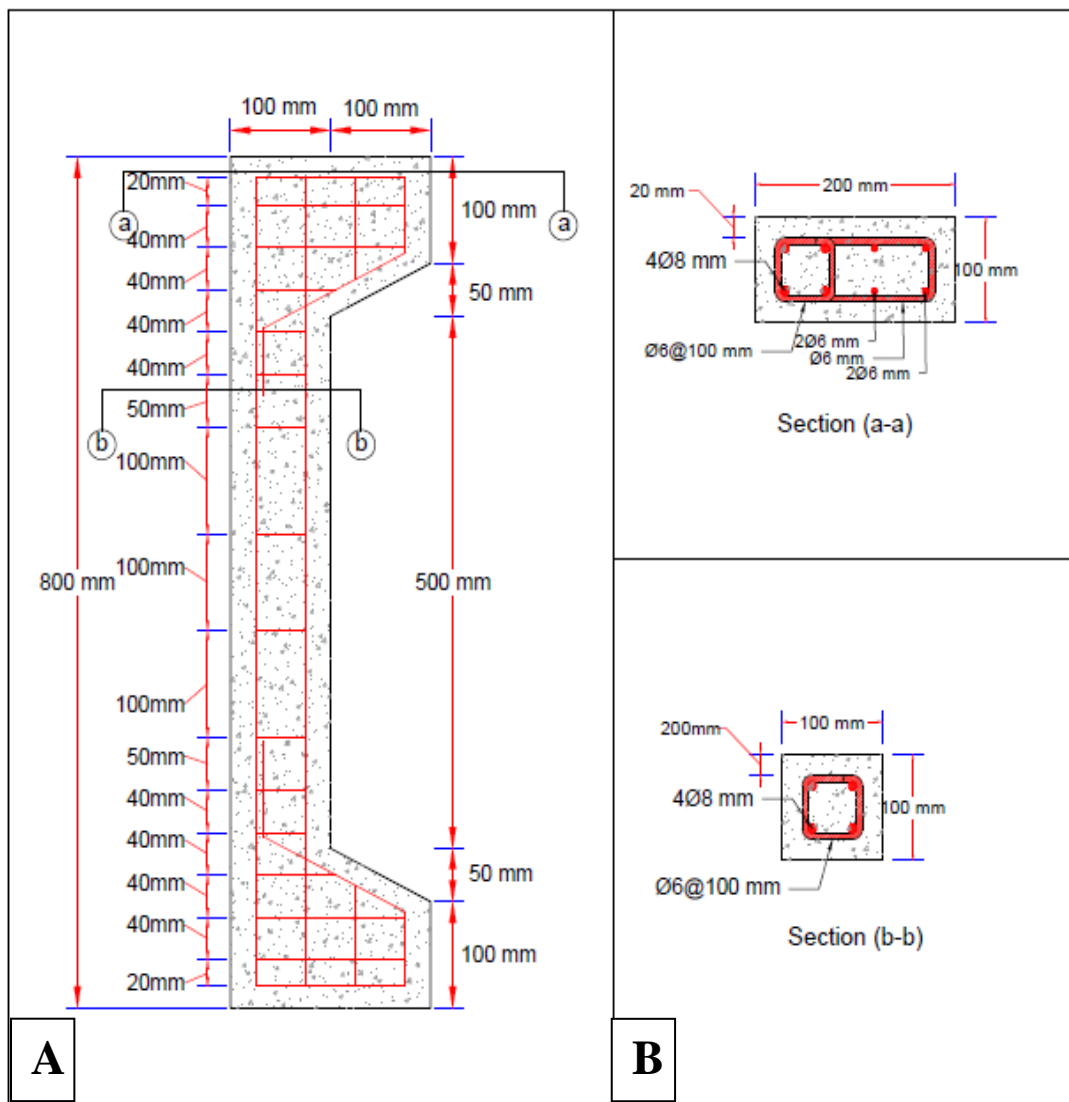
1. Details of steel reinforcement for the columns (A) Side view (B) Cross-section
